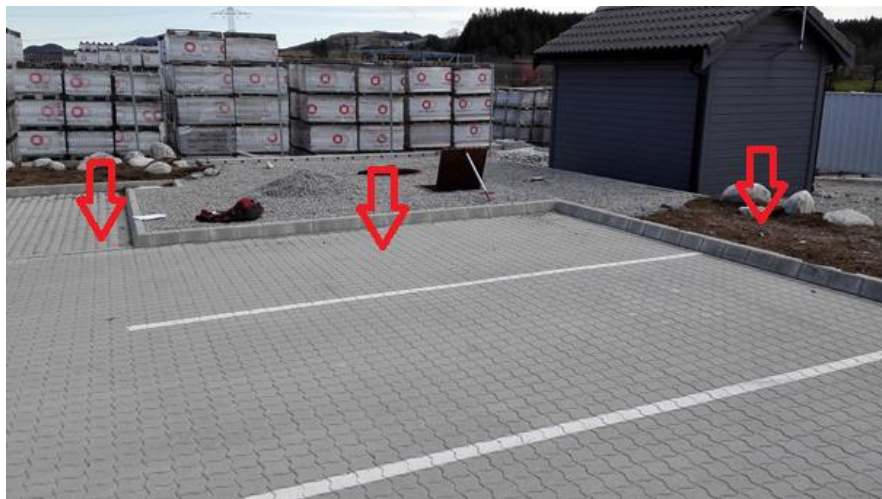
Approximately positions for the temperature meters at 500 mm depth, from the left permeable pavement, regular pavement and in the ground with no pavement (Photo: Jens H. Trandem)
